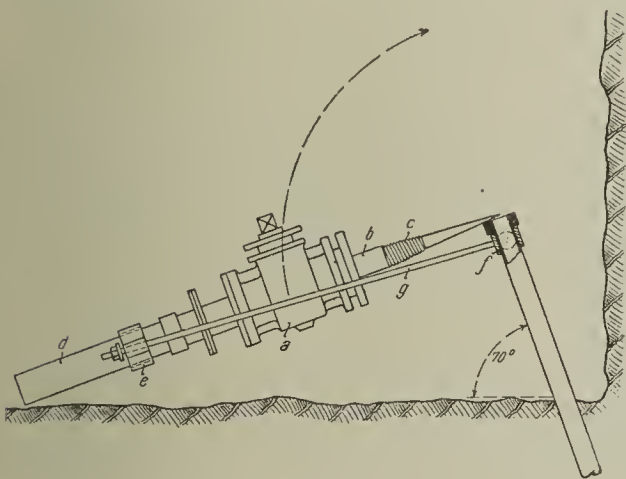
TAP AND PLUG READY FOR SWINGING.
